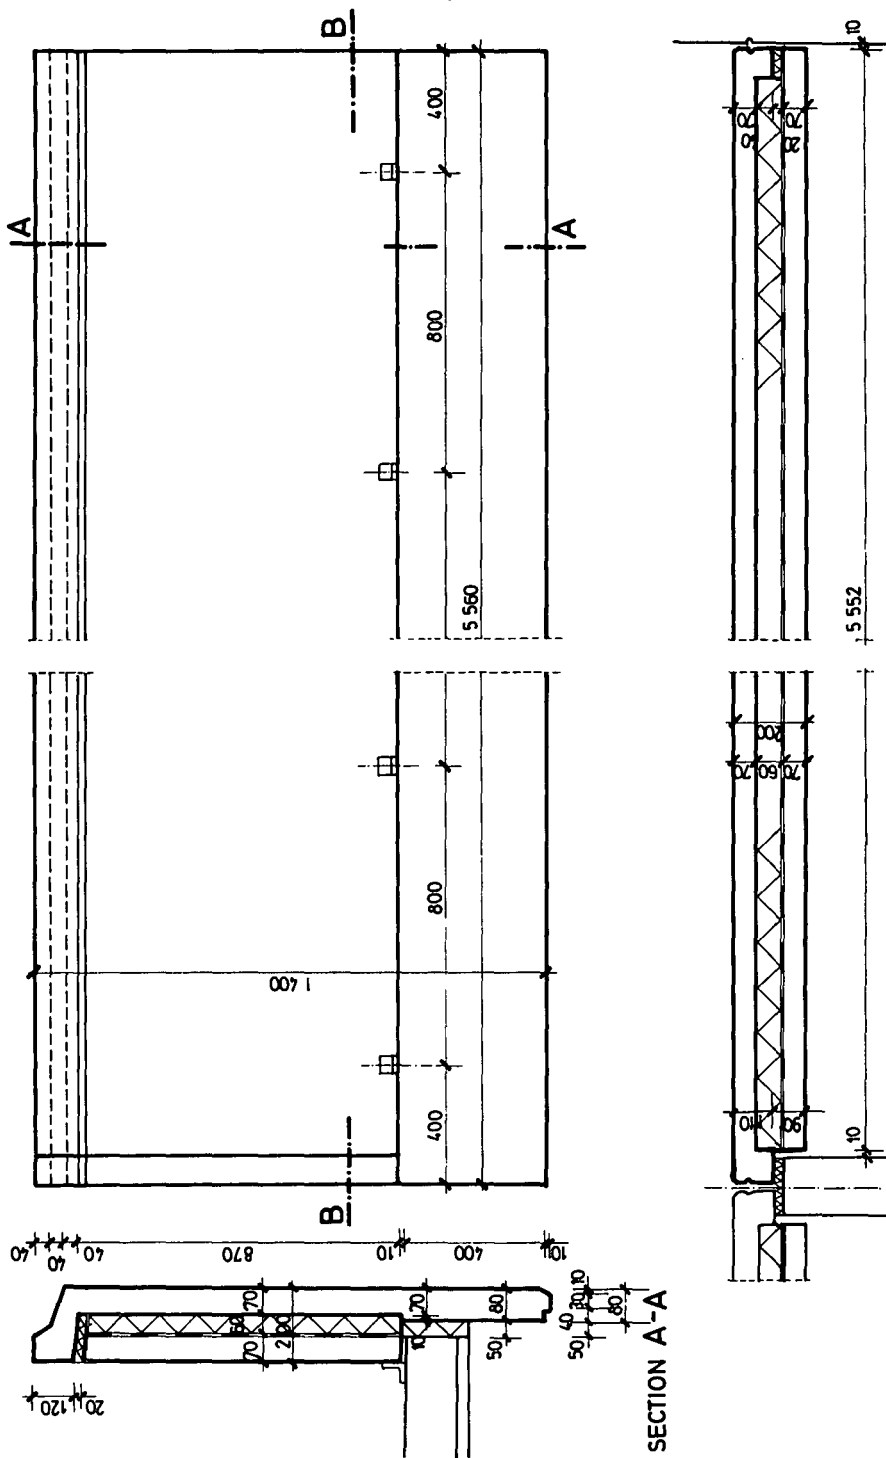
TYPICAL PREFABRICATED FASADE PANEL
